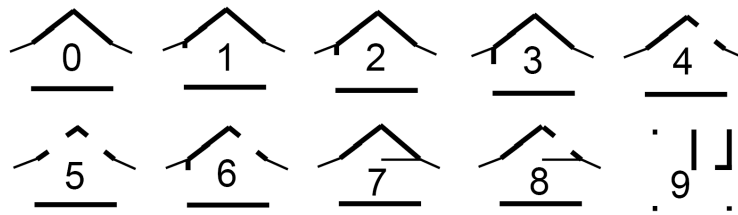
Opening variants tested. 0 to 8 are illustrated as vertical cross sections and 9 as floor plan.
